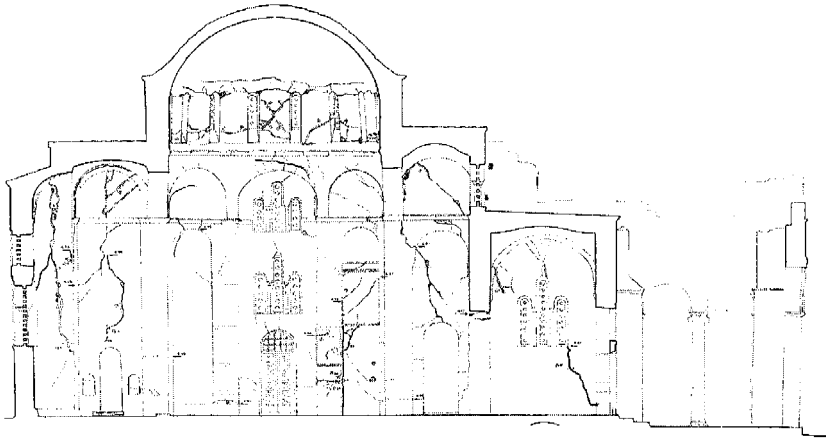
E-W longitudinal section - Crack pattern on the southern elevation.
